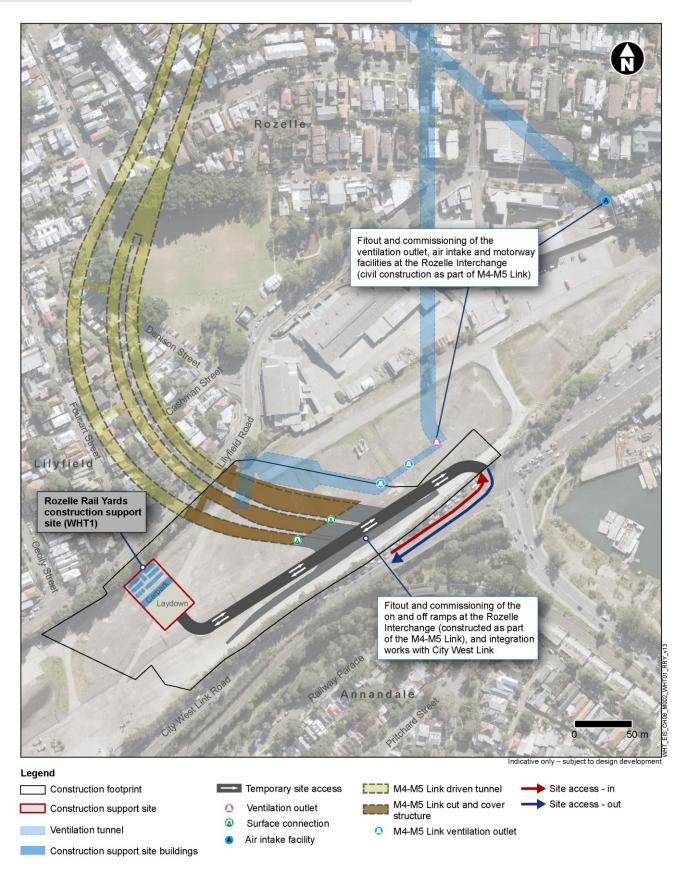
Indicative construction support site layout – WHT1 – Rozelle Rail Yards
